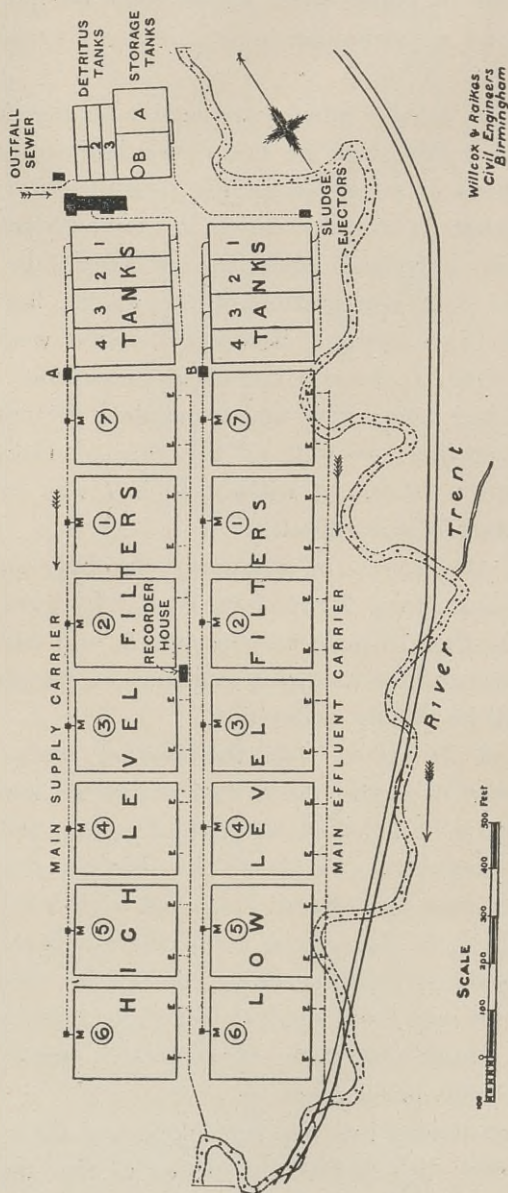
General Plan of Hanley Sewage Works, Showing Proposed Position of Recorder House and Venturi Meters on Two Main Supply Carriers at A and B.
